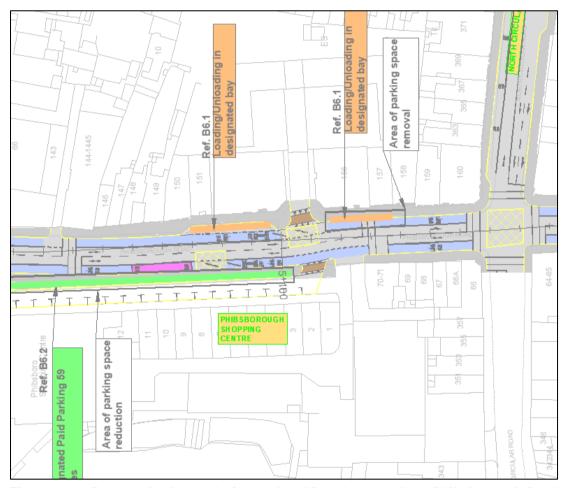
Proposed scheme design and parking changes along Phibsborough Road.
